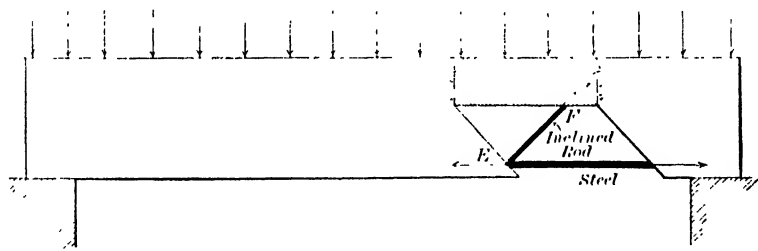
Beam with Break near End, illustrating Action of Inclined Rod. (See p. 446.)
